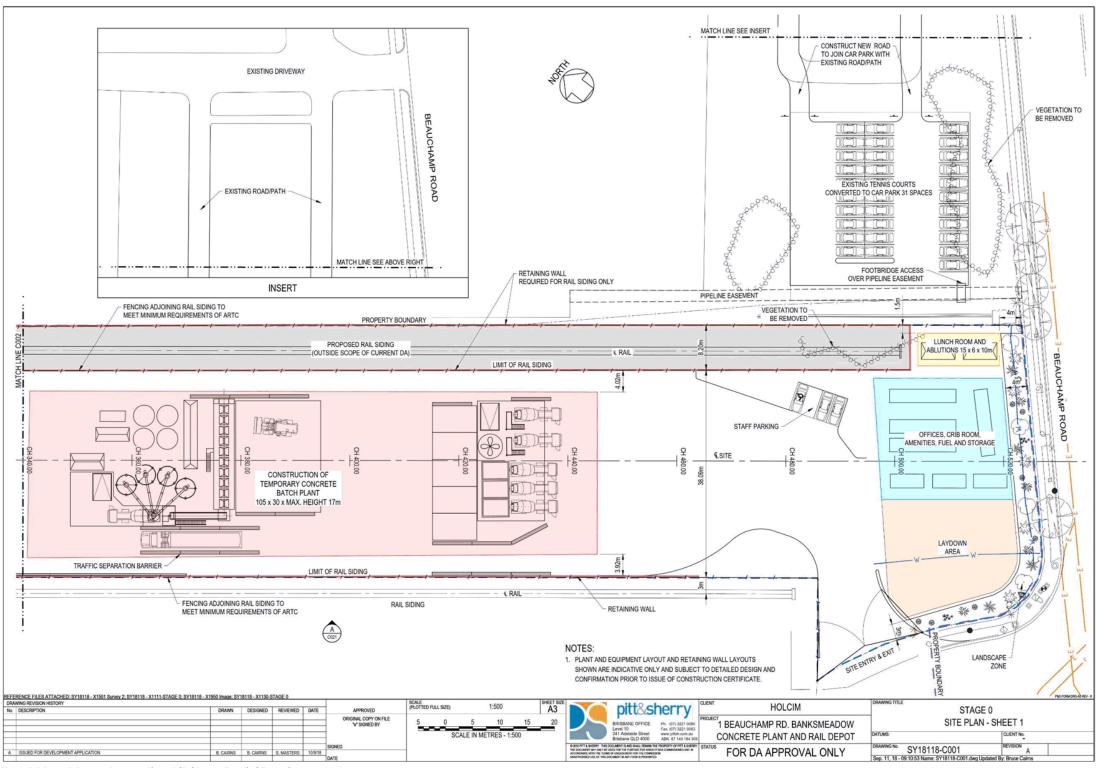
Stage 0 Concept Layout - Sheet 1 (Subject to Detailed Design)
